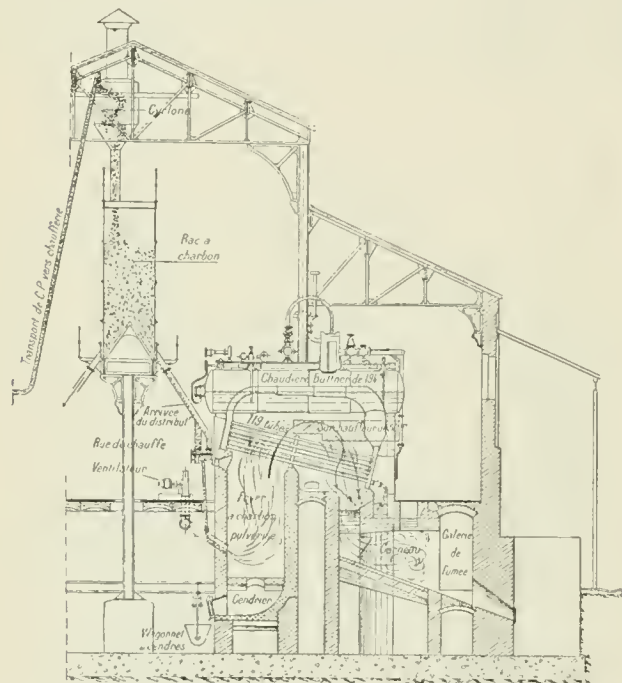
DIAGRAMMATIC VIEW OF THE BUTTNER BOILER EQUIPPED FOR BURNING PULVERIZED COAL
